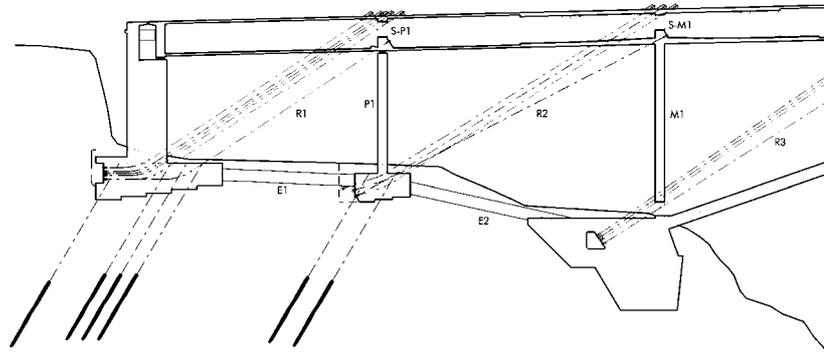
Backstays, ground struts and anchorages on the Gaia side of the river
